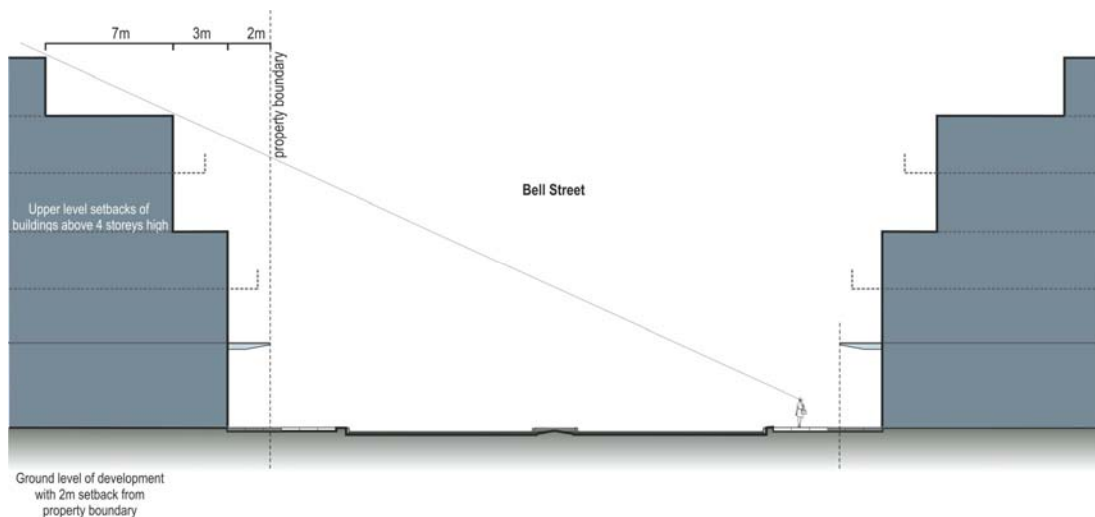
Indicative building setbacks between St. Georges Rd and High St.
